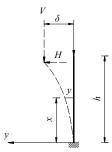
Calculating Diagram of Equal Section Column Ignoring Dead Load
